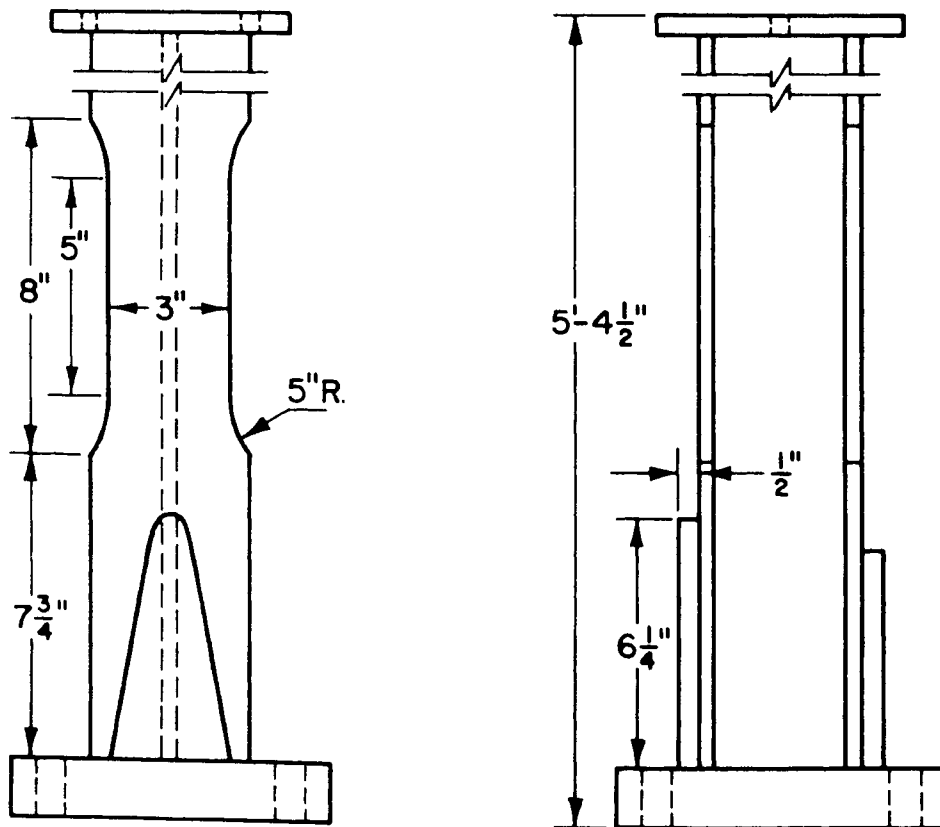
ELEVATION VIEW OF MODEL TEST STRUCTURE NO. 6
